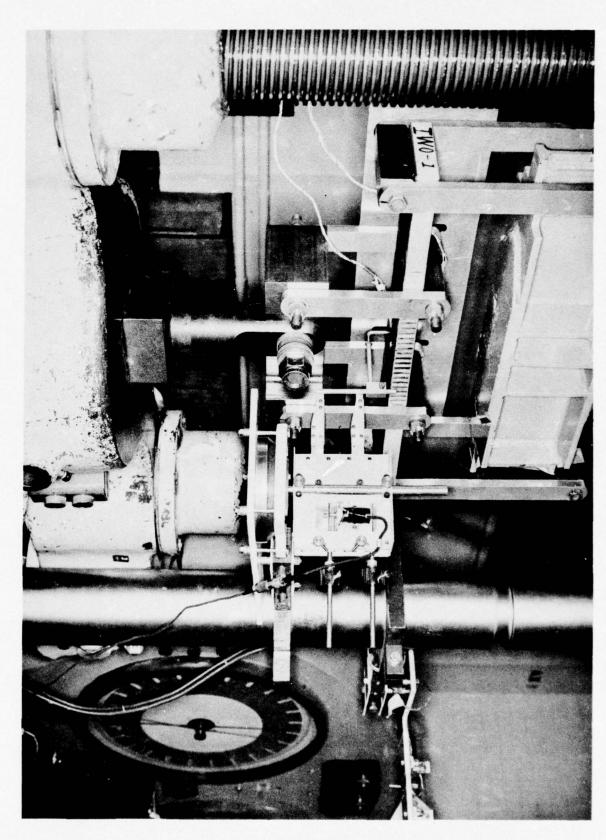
TEST SET-UP FOR FLEXURAL BEAM SPECIMENS (TR-141)
